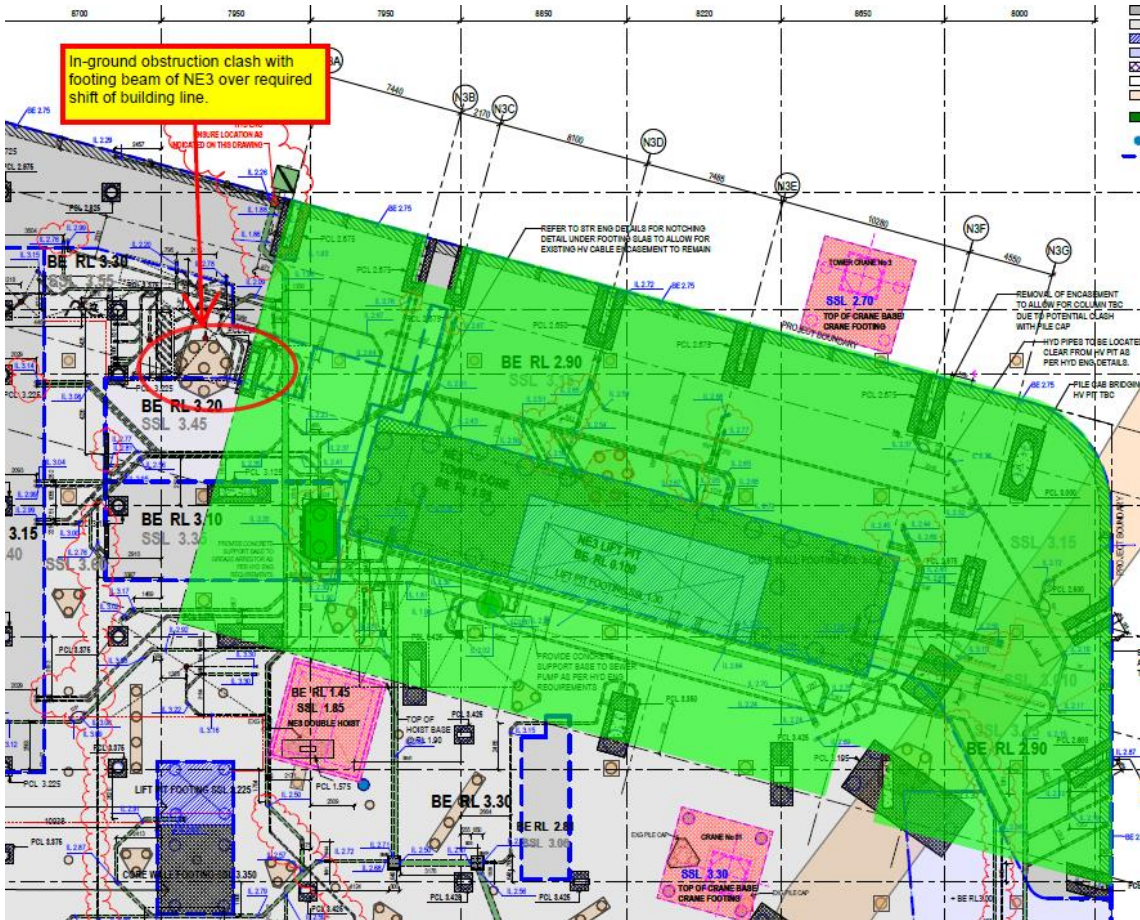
Existing foundation (circled in red) compared to location of Building NE3
